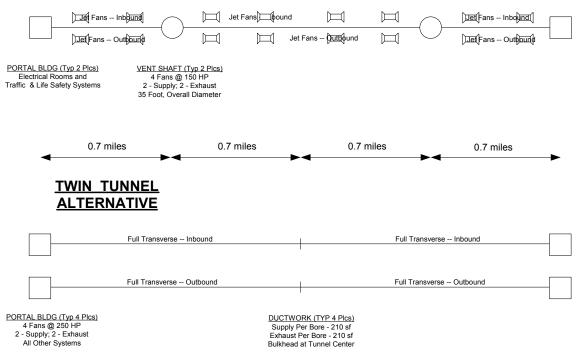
Schematic of Tunnel Alternatives, Ventilation Design
